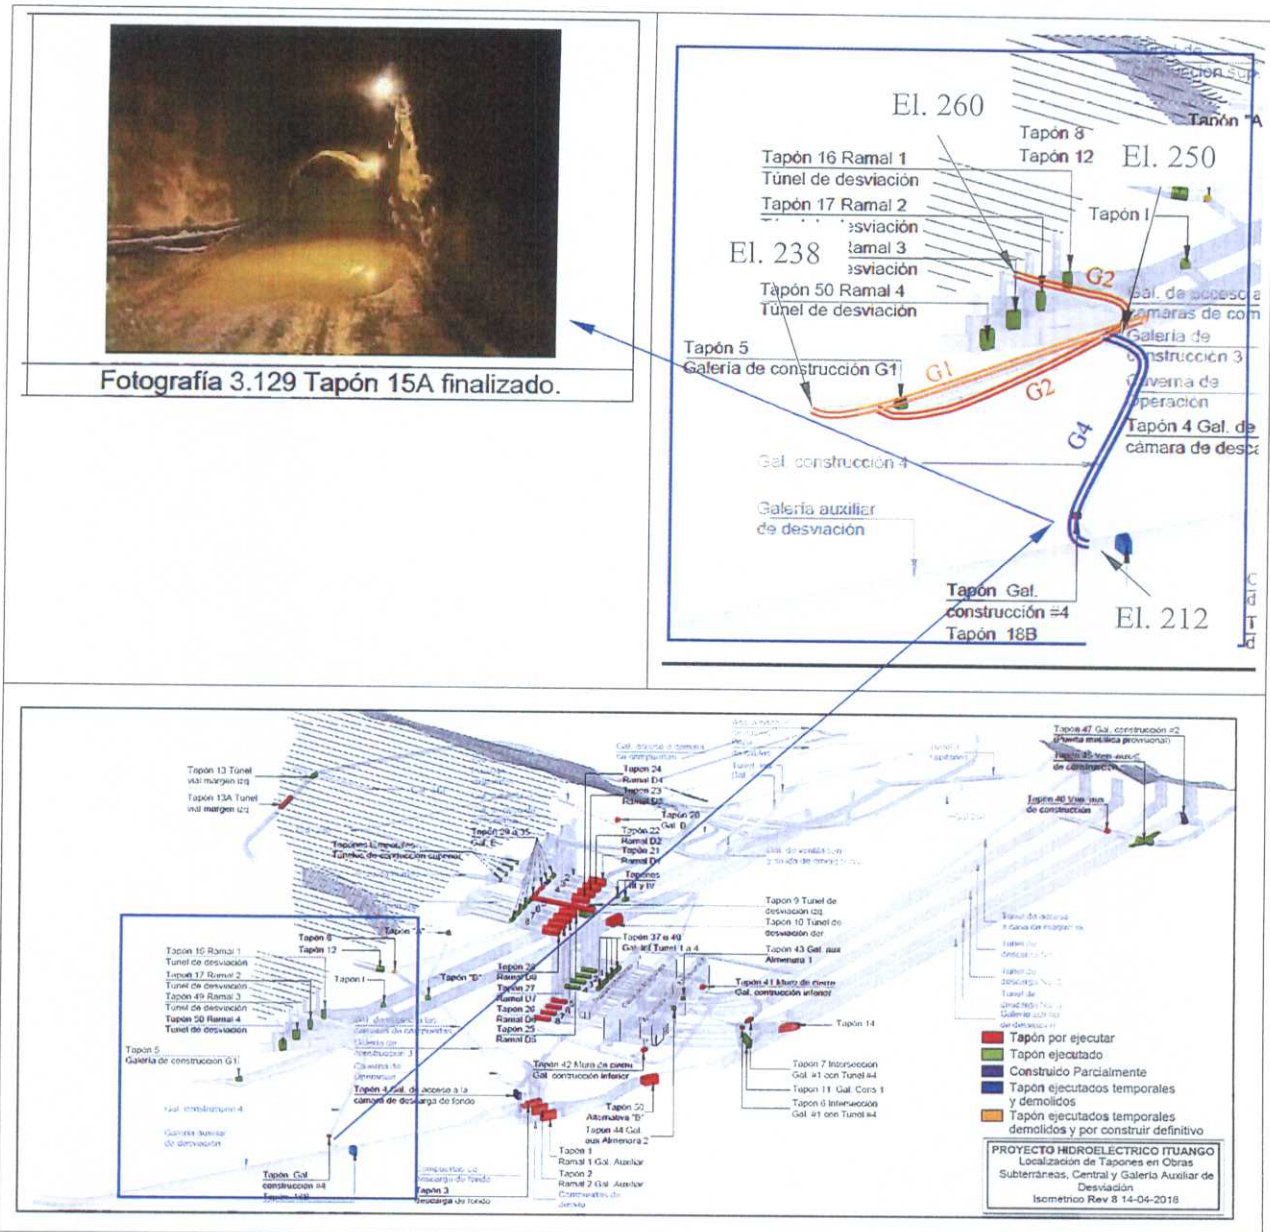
Location of concrete barrier (Tapón 15A)^{185,186}. Elevations are at invert¹⁸⁷.
